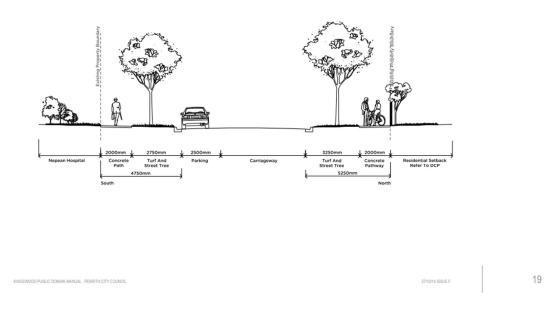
B: Kingswood Public Domain Manual Barber Avenue Section
